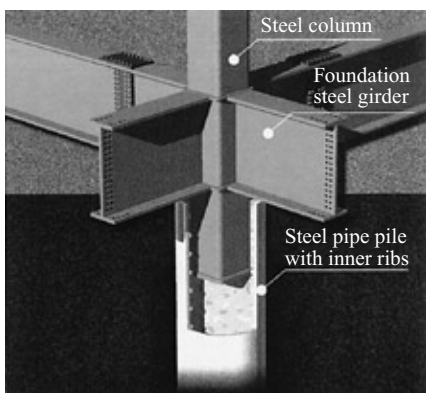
ICHI-ICHI KISO, non-footing column pile joint
